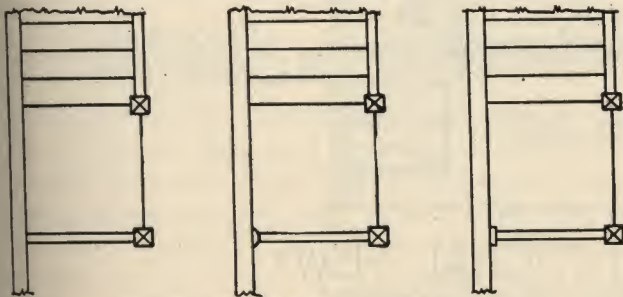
Plan of stairs on second floor with proper space for handrail.
